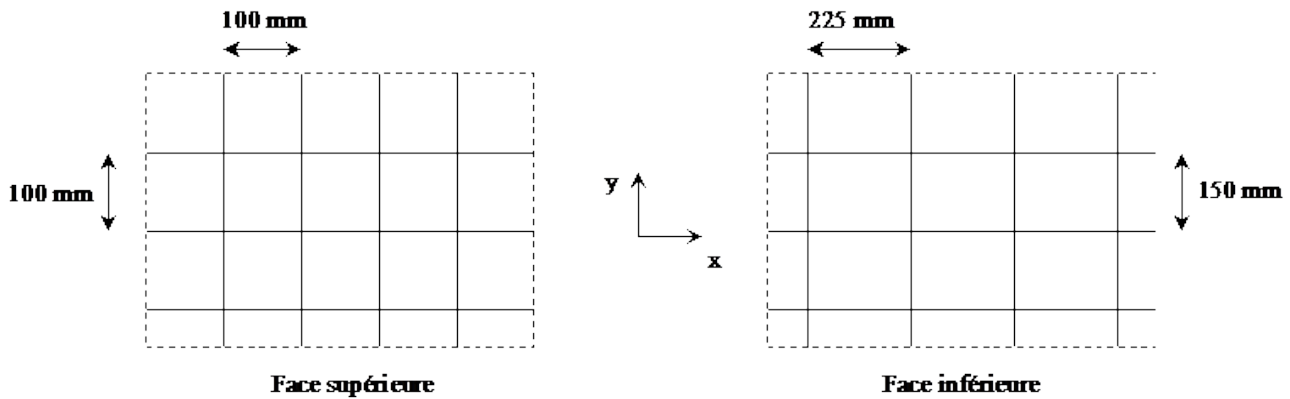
Distribution of steels in slab. Compressed zone (on the left) and zones tended (on the right)
